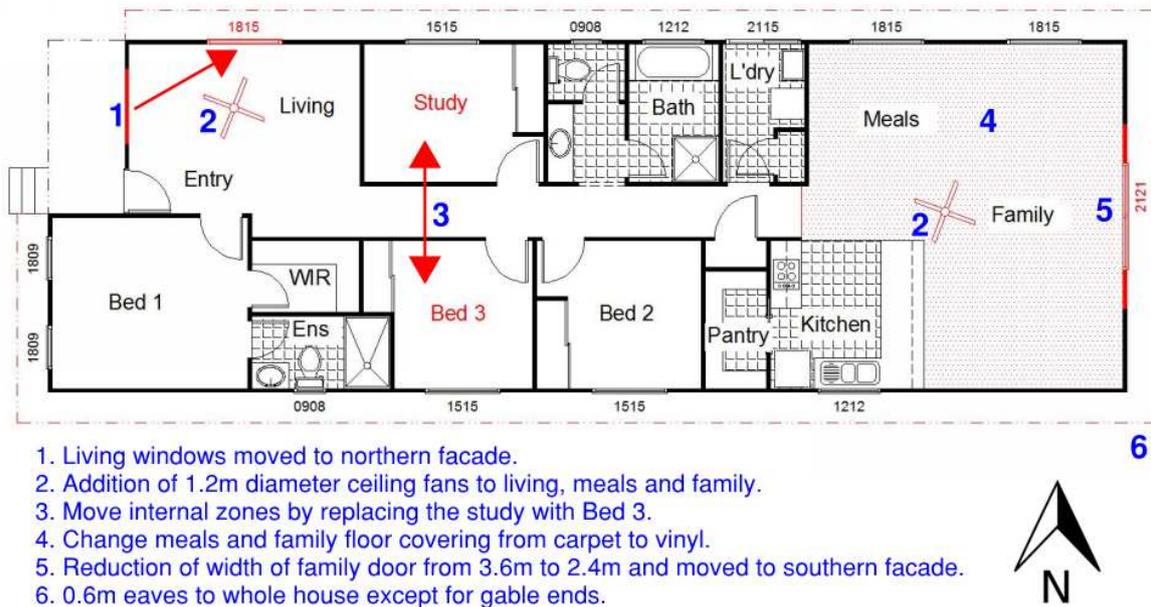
Redesigned floor plan for Dwelling 6 in Brisbane, Perth and Sydney.
